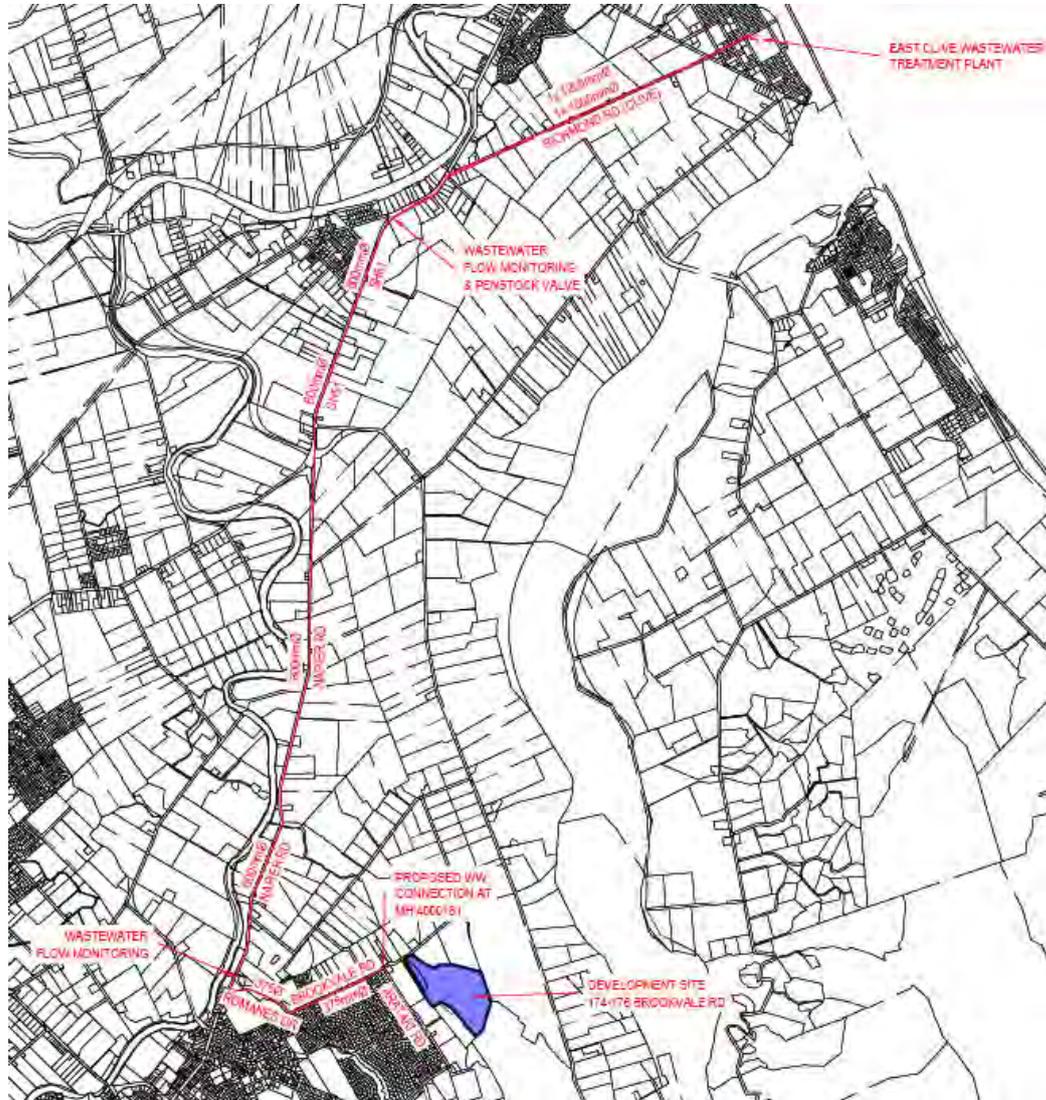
Maven Plan C501 – Public Wastewater Treatment Plant, 11.4km from the site
